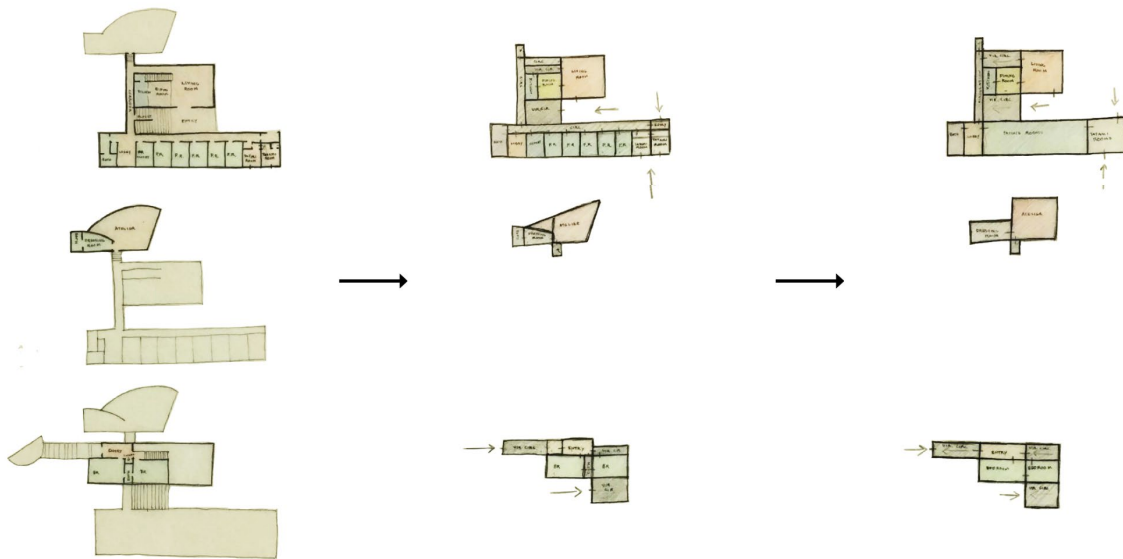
Koshino House Floor Plan & Preliminary Layout Abstractions¹²
